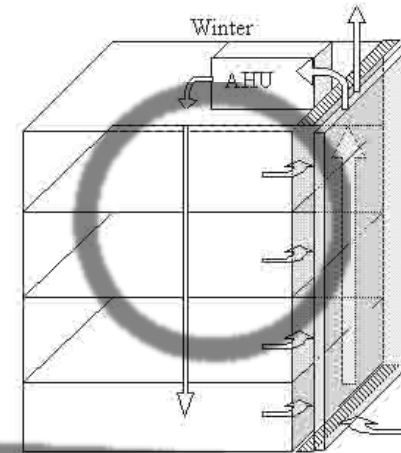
Double Skin Façade as a central exhaust duct for the ventilation system.
